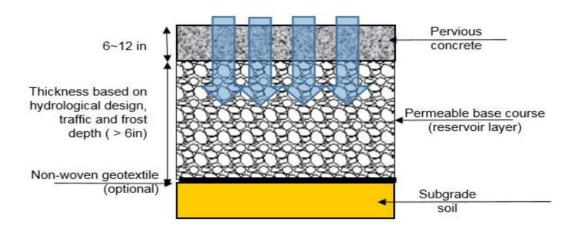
Typical cross section of a pervious concrete pavement (Nassiri, et.al, 2017)
